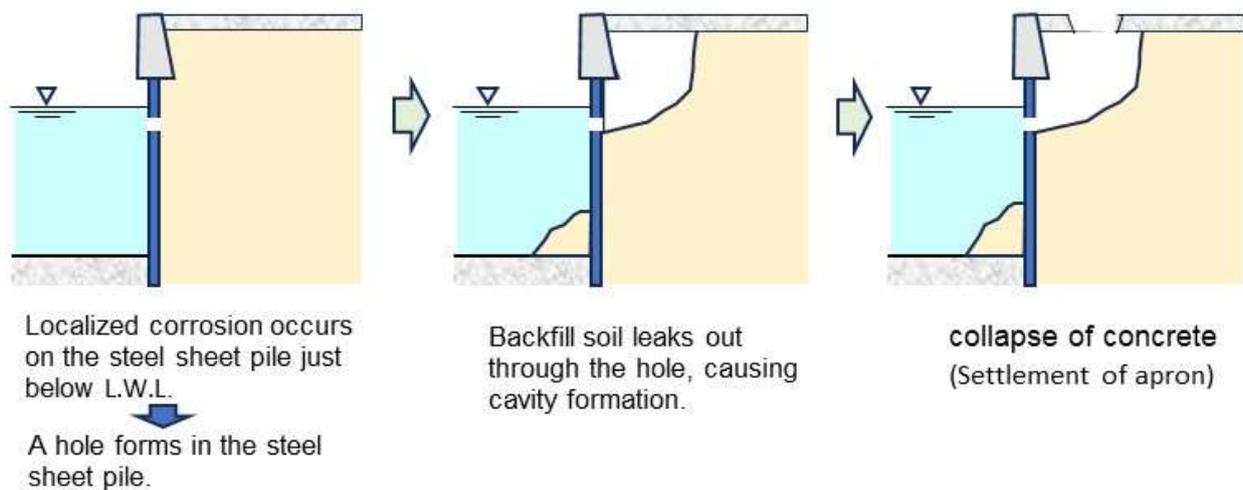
Mechanism of apron collapse caused by corrosion of steel sheet piles
